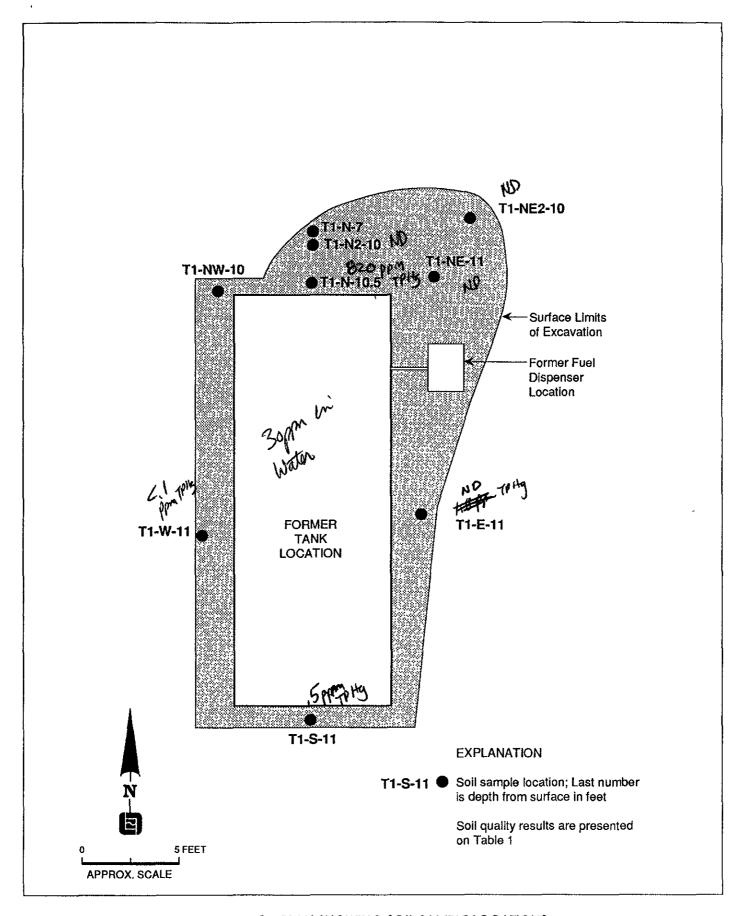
PLAN SHOWING SOIL SAMPLE LOCATIONS
